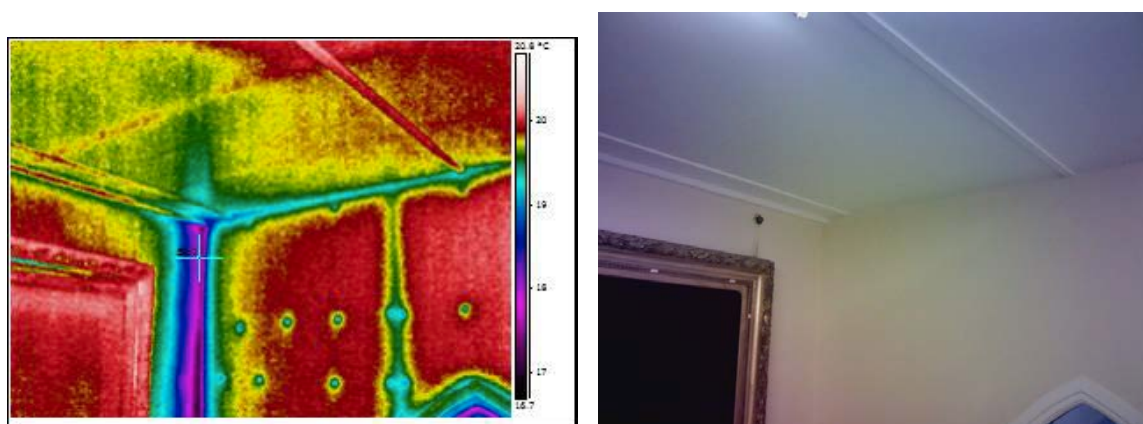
Staircase hallway. The image shows the thermal bridge at the junction of internal wall and external wall. Because the building is internally insulated, it is expected to see such a thermal bridge. It also shows the fixing points of insulation panels. This pattern can be found all over the building.
